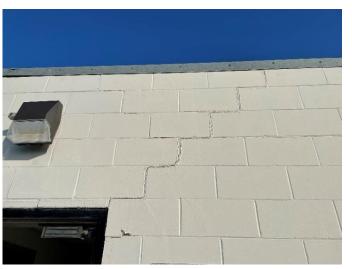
Previously Repaired Masonry Cracks
